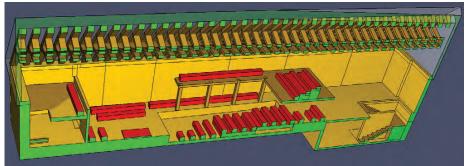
Geometry of the constructed model showing the fire location (Scenario 1), smoke extract vent, gallery and auditorium floors, guildhall accommodation stair to ground floor and roof timber joists.
